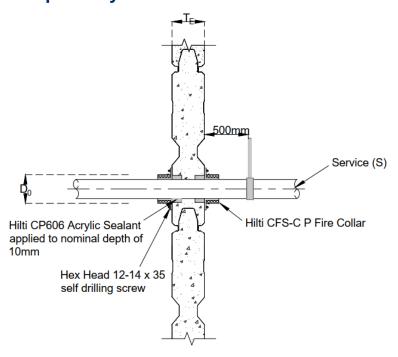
uPVC/uPVC-SC plumbing pipes < 150 mm in Dia. through minimum 51 mm Korok panel system
